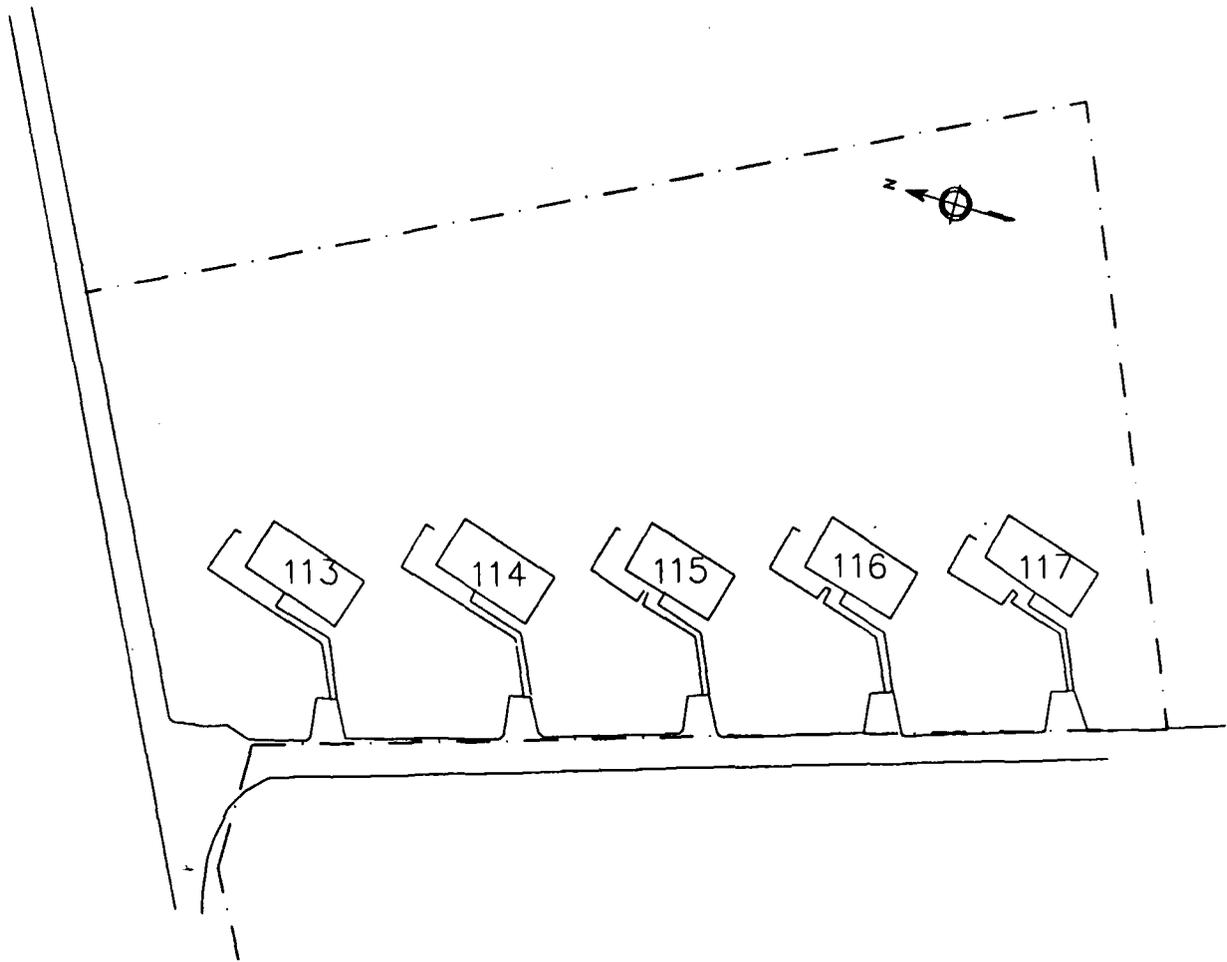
Site Plan Map of Coraopolis PI-71L Army Housing Units
